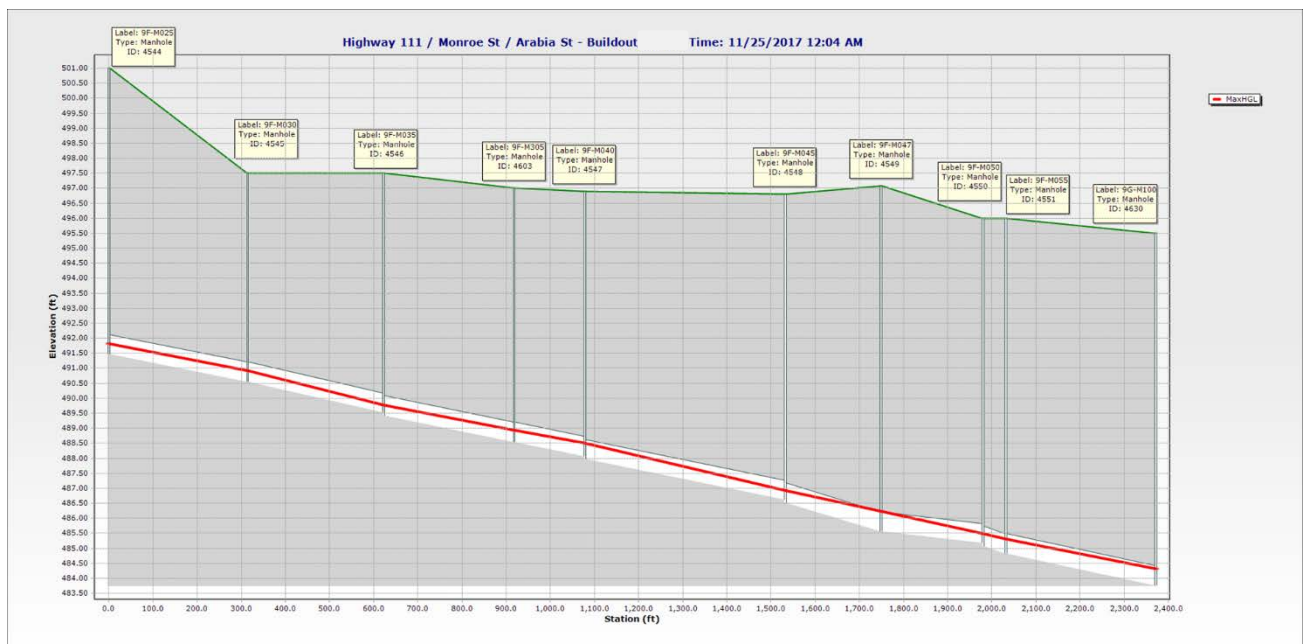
Highway 111 between Monroe St and Arabia St under Build-Out Conditions
